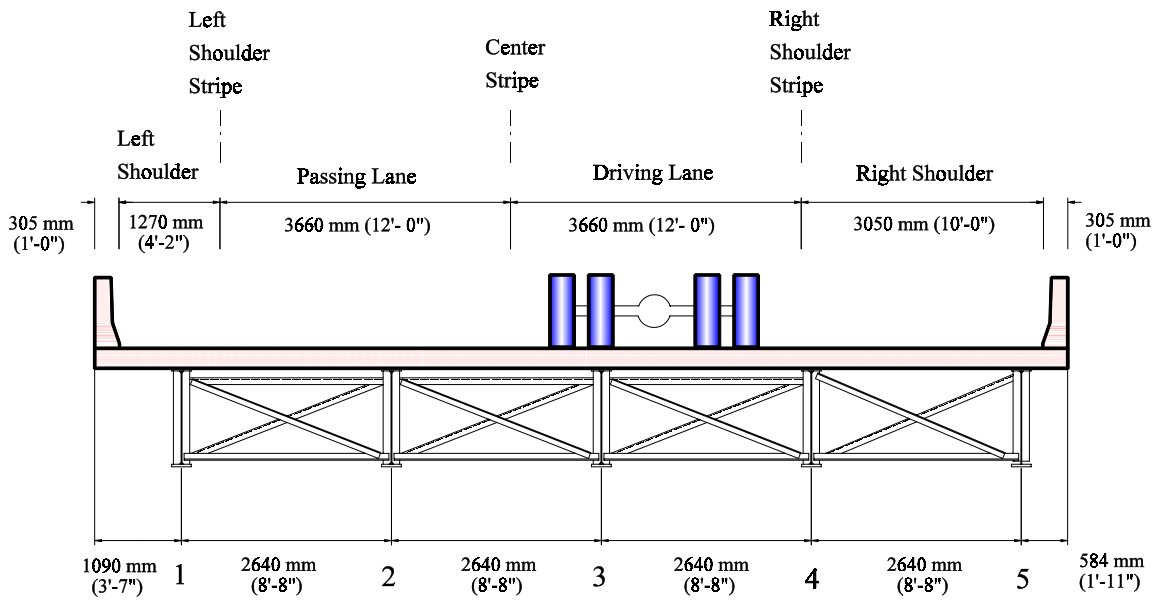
Location for test truck positioned in center of driving lane (Pass No. 2).
